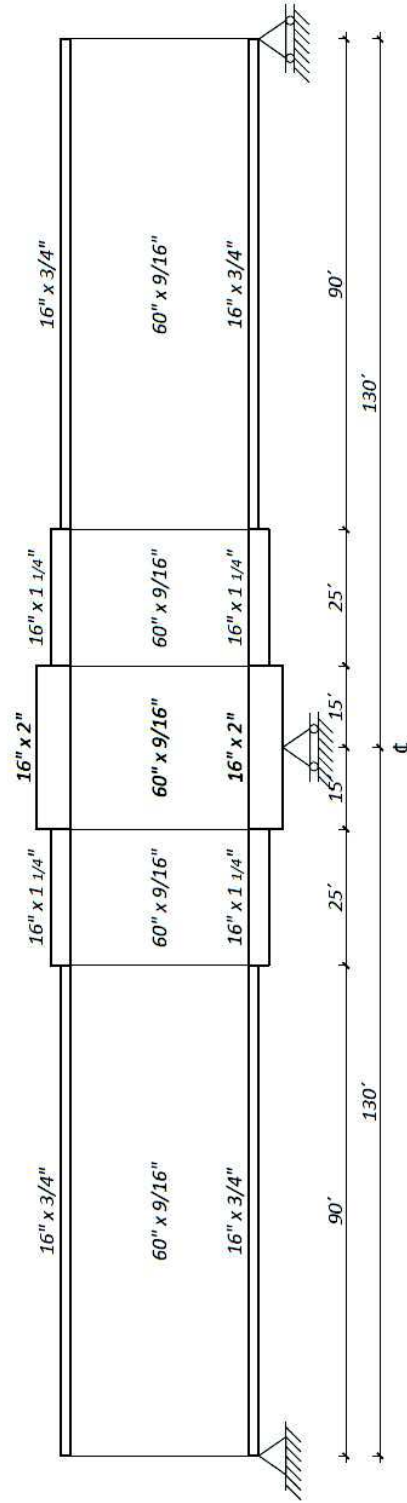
Sketch of the typical 130'-130' two-span composite steel I-girder bridge
